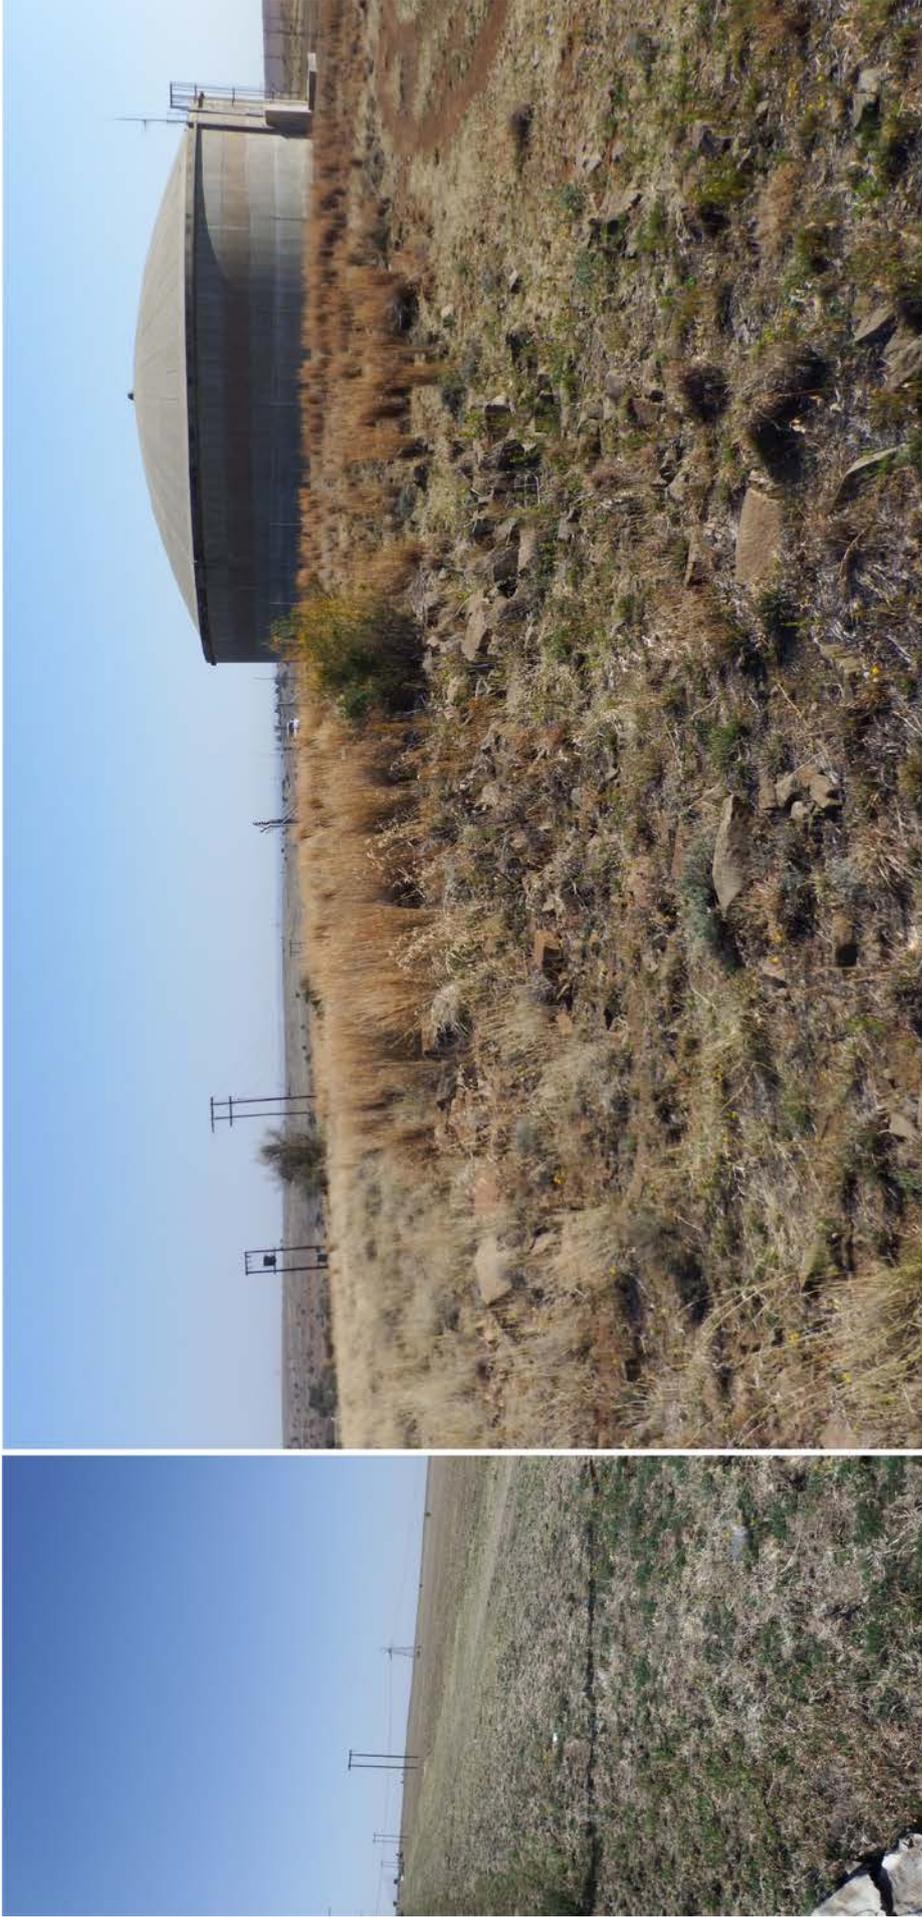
The construction site of the proposed new 5MI reservoir at the existing Ventersburg reservoir.
